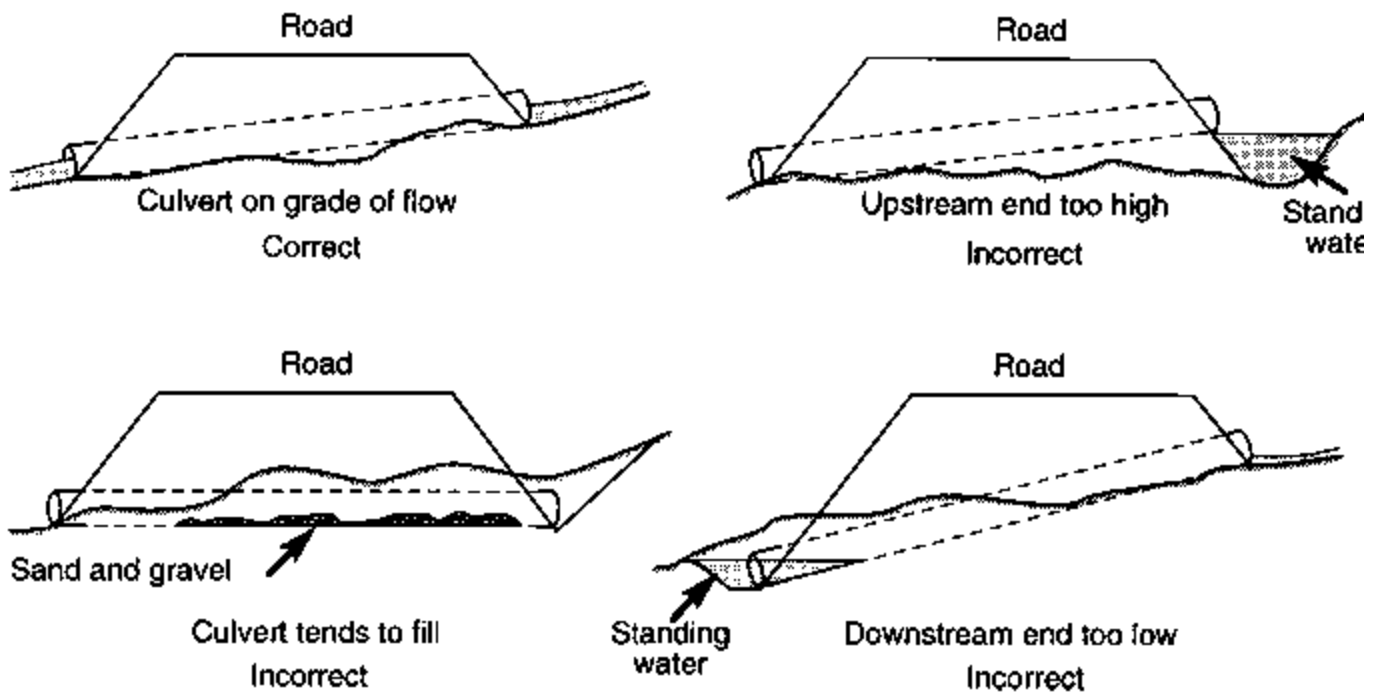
Correct and incorrect installation of culverts (adapted from 131).
